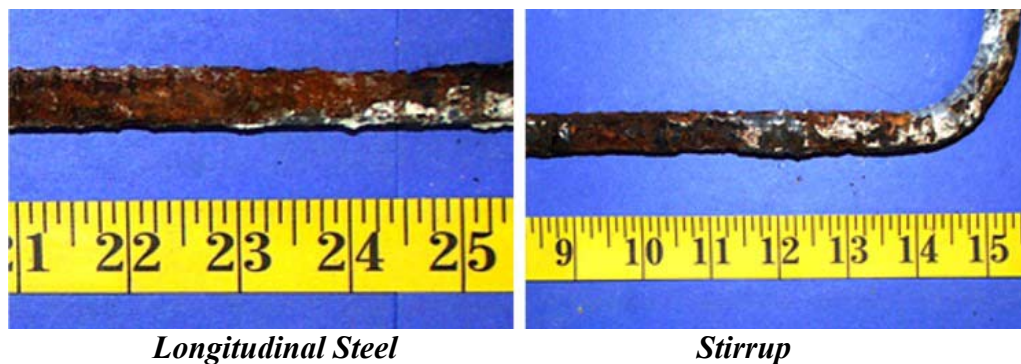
Specimen 1.3 Mild Steel Bar and Stirrup
